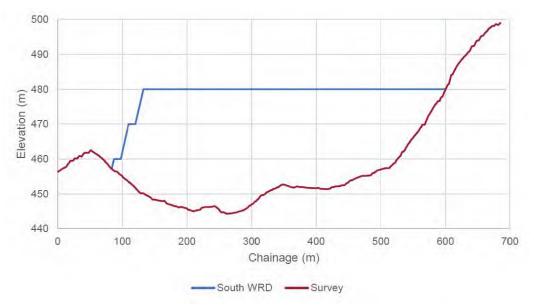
Waste Rock Dump (South) Cross Section 1 (ATC Williams, 2022)
